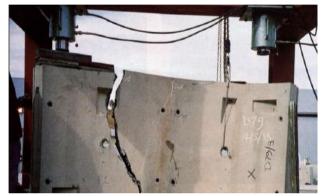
Example of fibre-reinforced concrete tubing element examined in the natural scale [6]
